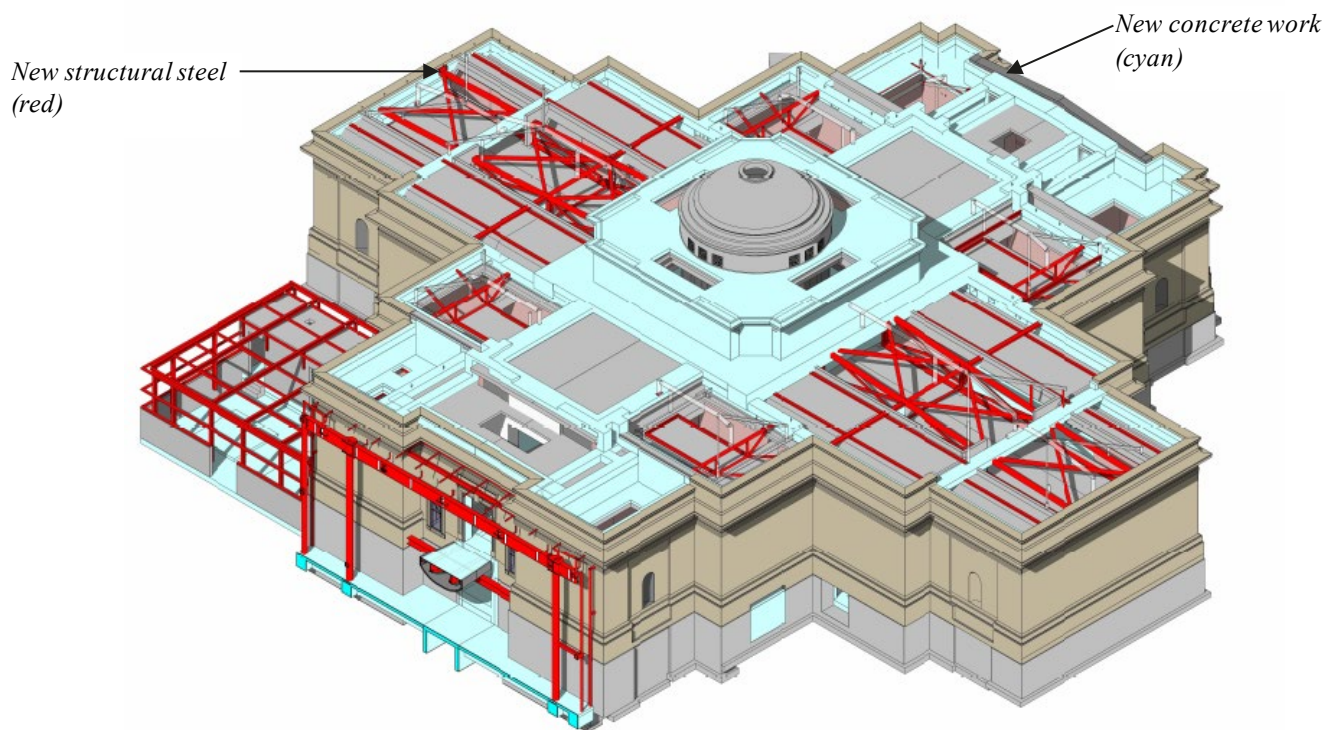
3D Image of the Overall Strengthening System showing the new structural elements.
